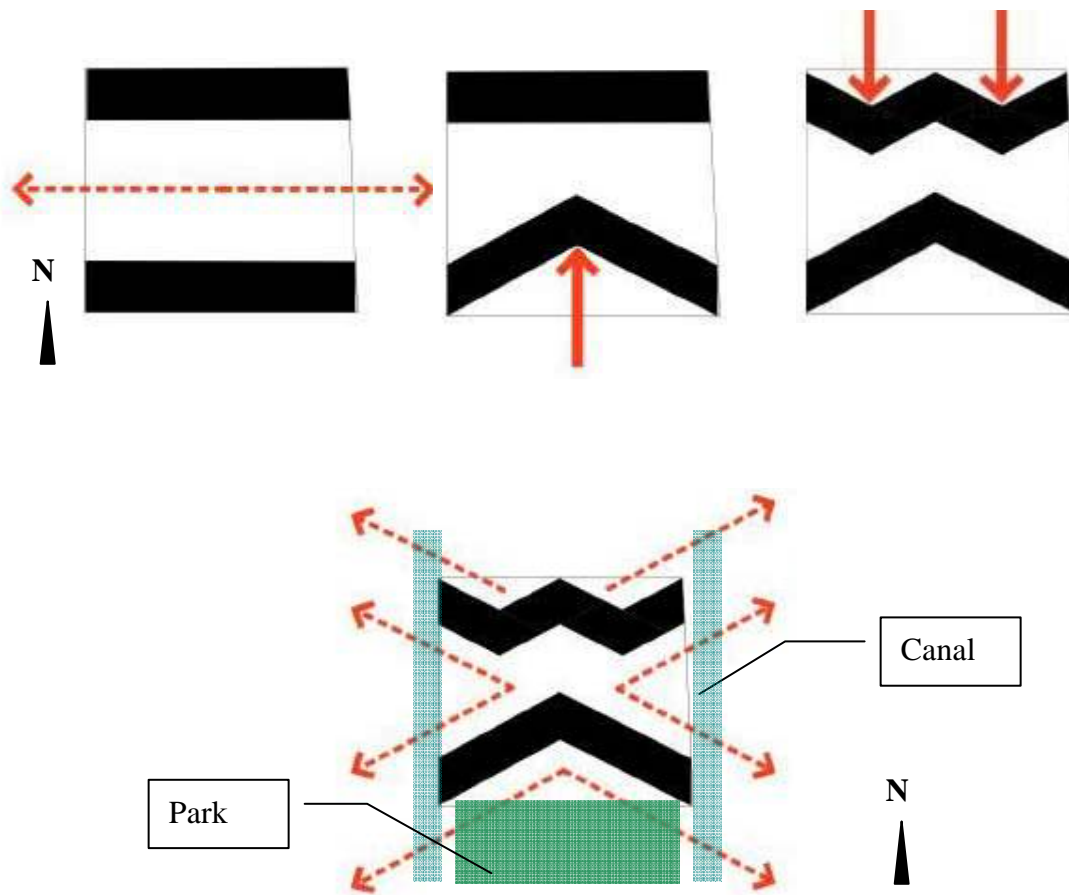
Concept plan of the overall site planning
